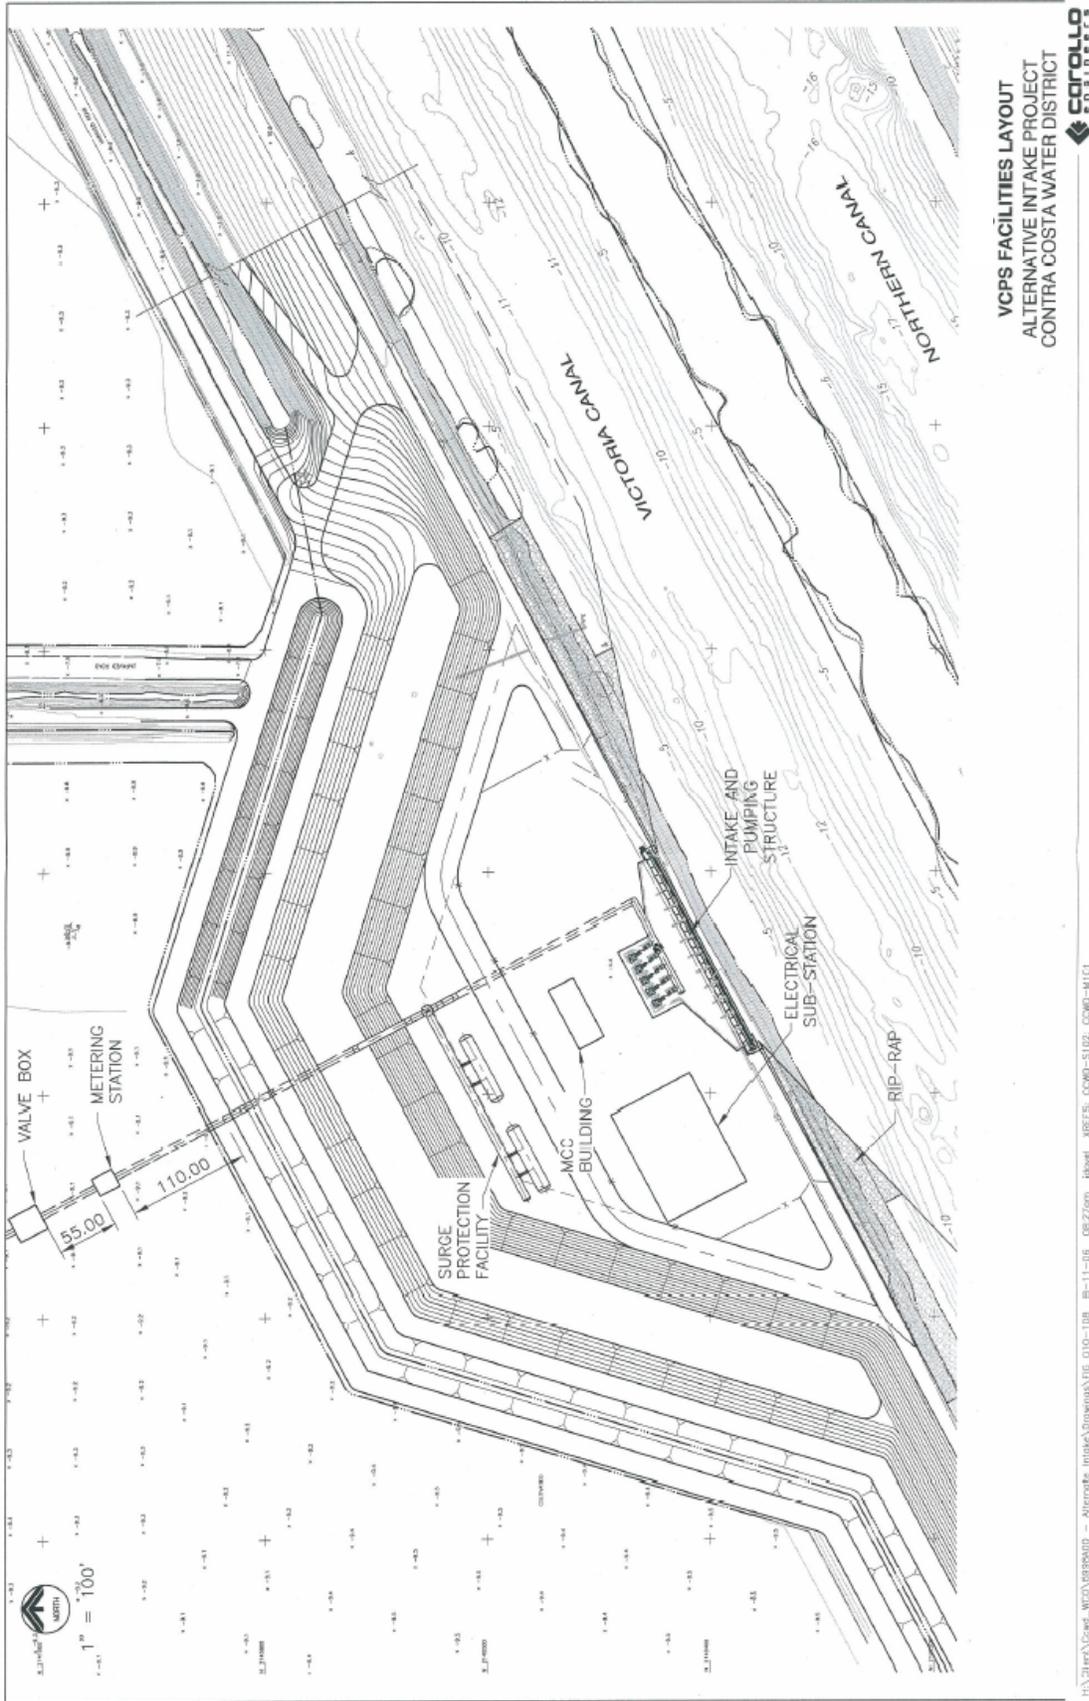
Plan 1 – Plan View of the Proposed Victoria Canal Intake and Pumping Station
